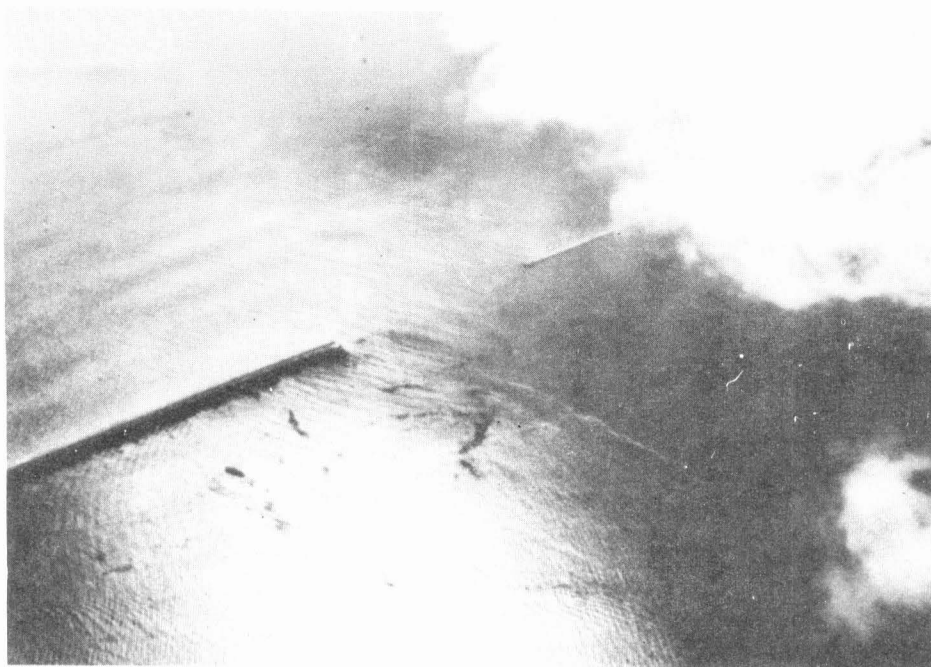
AIR VIEW TOWARD SOUTHWEST FROM 5,000 FT. ELEVATION
